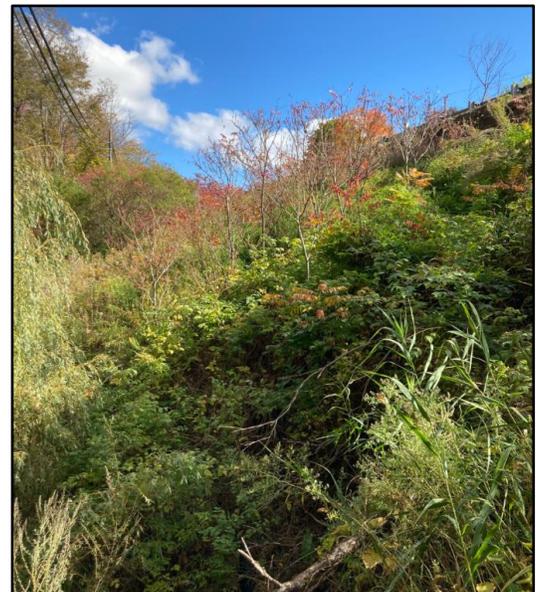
North culvert inlet, looking northwest (erosion near northeast side of culvert not shown) (Spring 2024)
